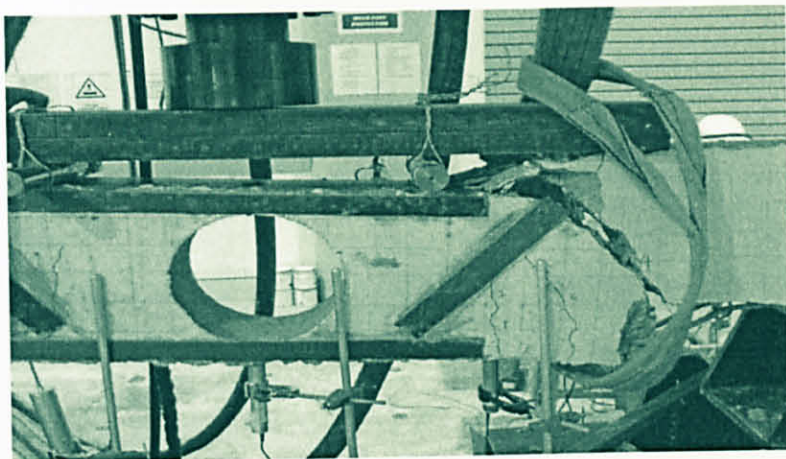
Failure of beam with large circular opening at middle of the beam pasted with CFRP strips
